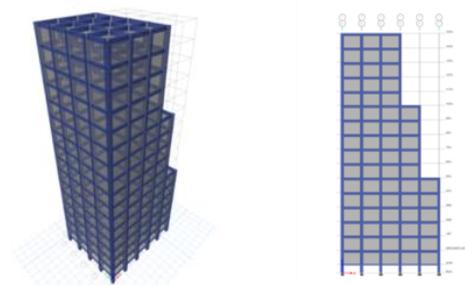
(a): 3D Model and (b): Elevation of Model-1
